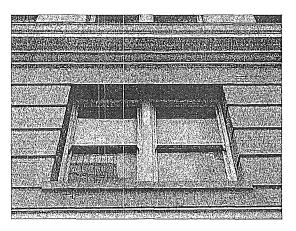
Photograph of typical punched window opening and painted brick cladding (photograph taken on 01/26/2018).
